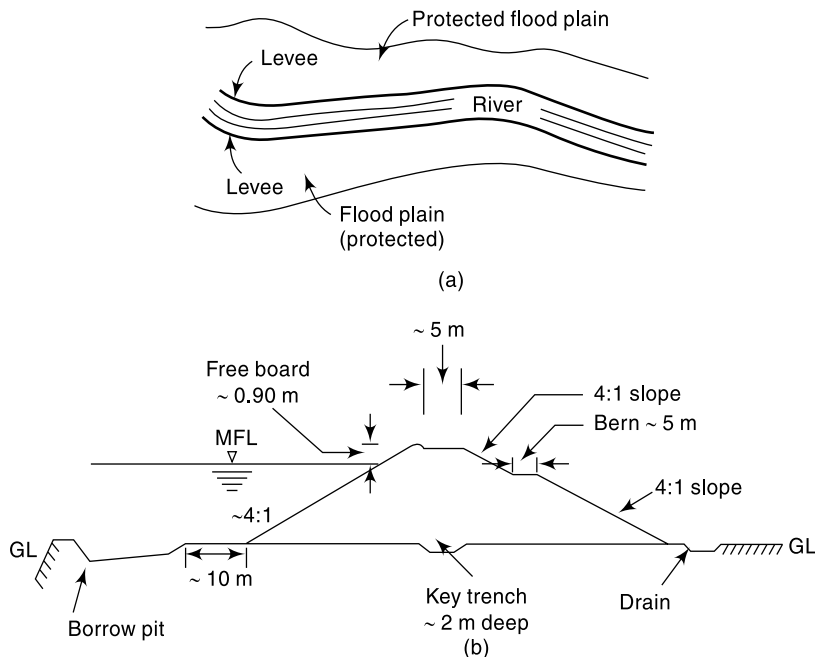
A typical levee: (a) Plan (schematic), (b) Cross-section
